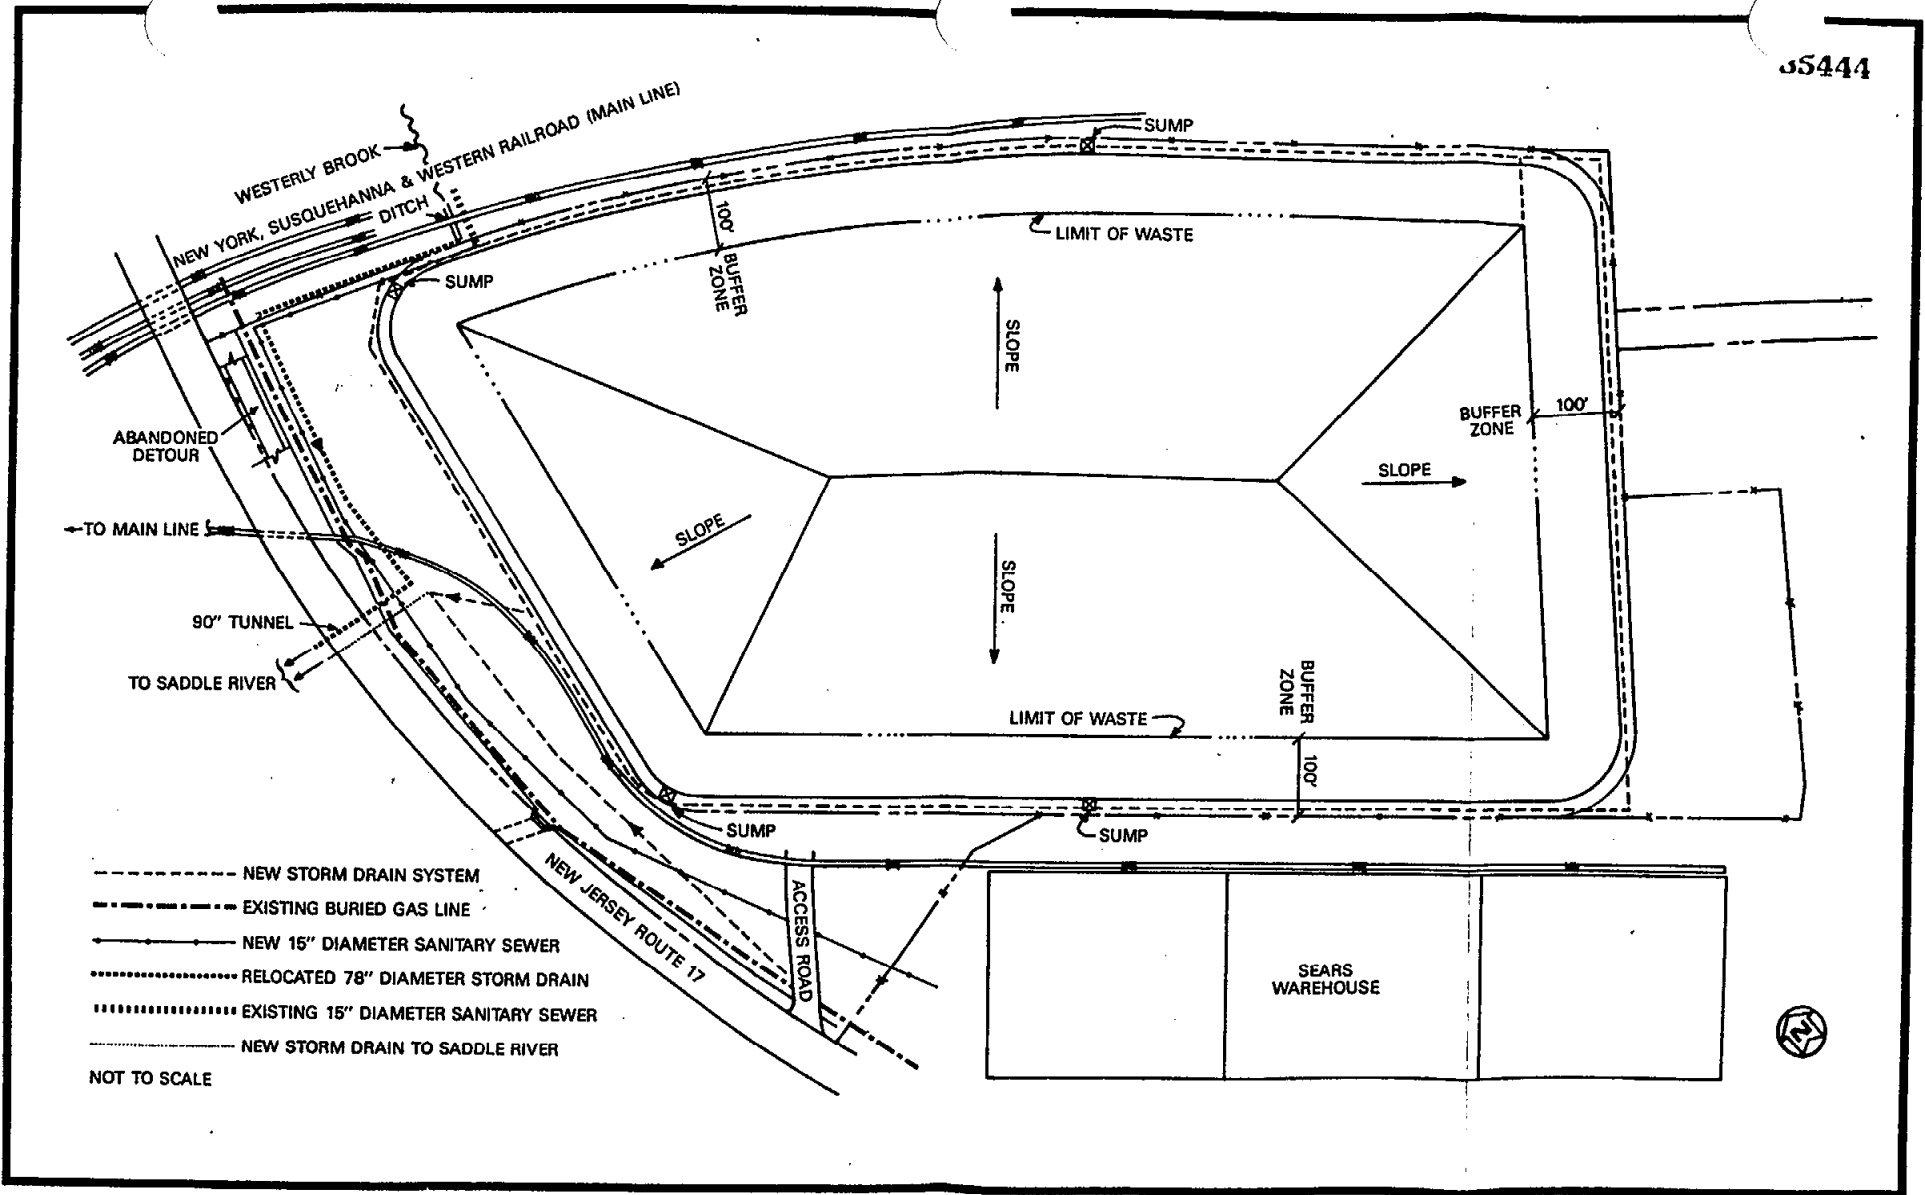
RELOCATION OF UTILITIES AT THE MAYWOOD DISPOSAL SITE (ALTERNATIVE 2)
